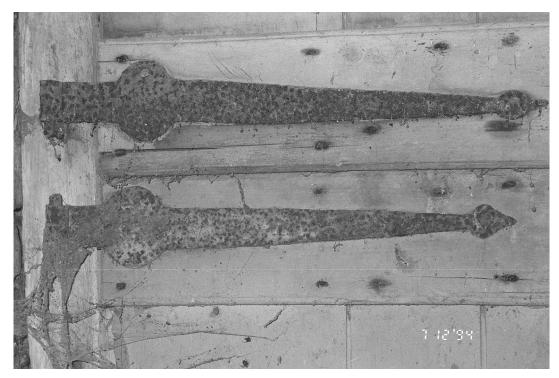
Detail of wrought iron strap hinges on interior of "Dutch" basement door at the McCutcheon House.
